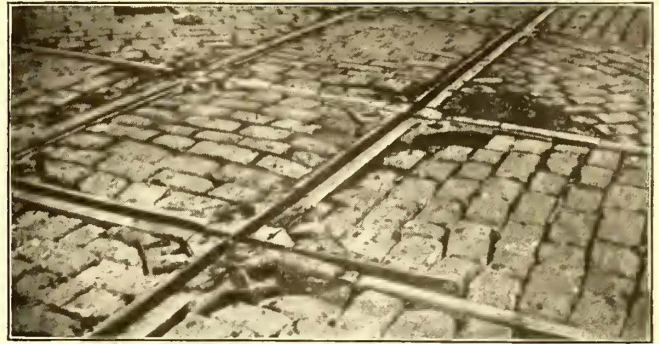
SAME RAIL INTERSECTION AFTER REPAIR WORK HAD BEEN COMPLETED
